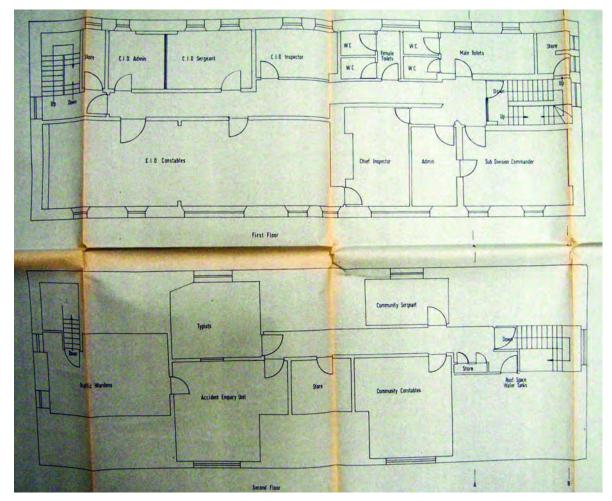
Plan of alterations to Redland Police Station, first and second floor, 1986 (BCC)
